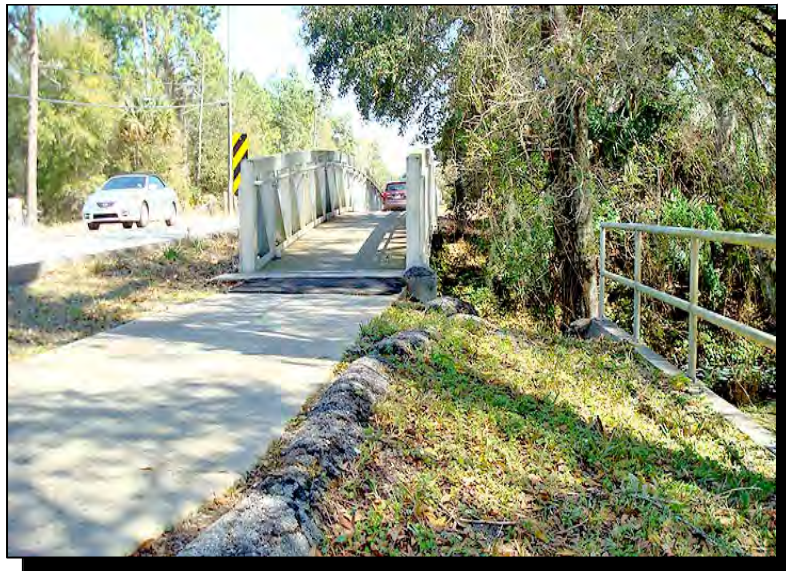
Pedestrian and bicyclist bridge on Taylor Road, east of Boggs Ford Road
